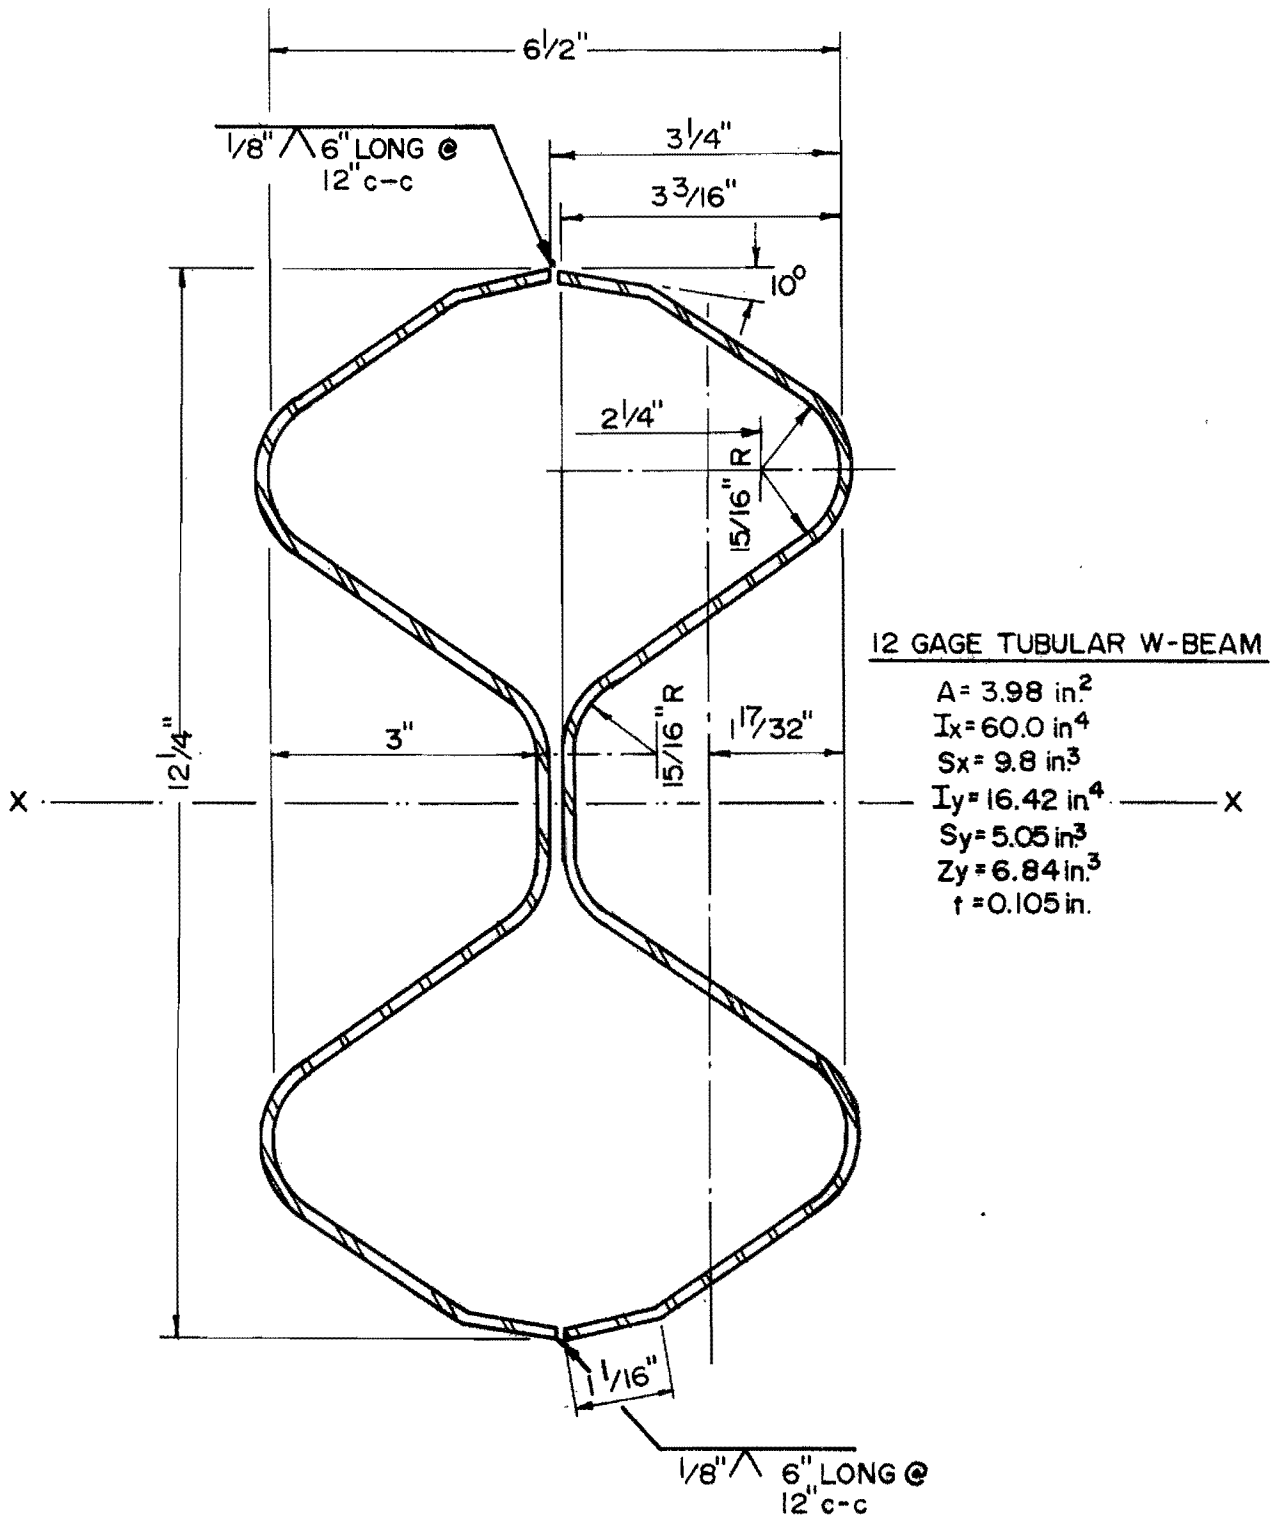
12 GAGE TUBULAR W-BEAM.
